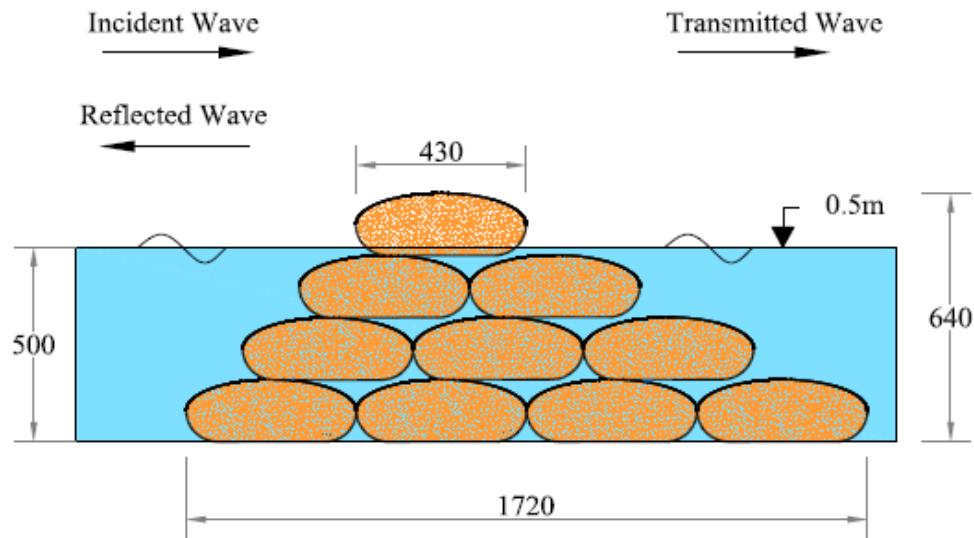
Typical Cross Section of Geotextile tube Section (GTS)
